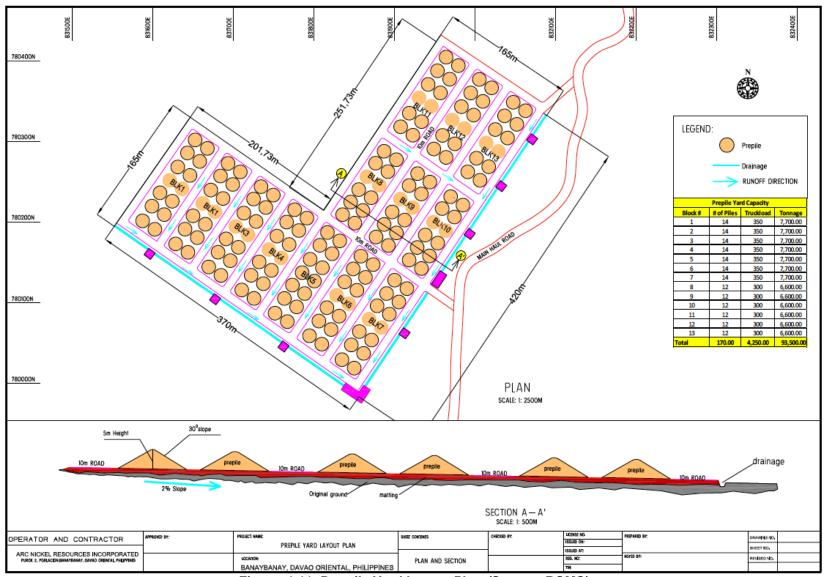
Pre-pile Yard Layout Plan (Source: RCMC)
